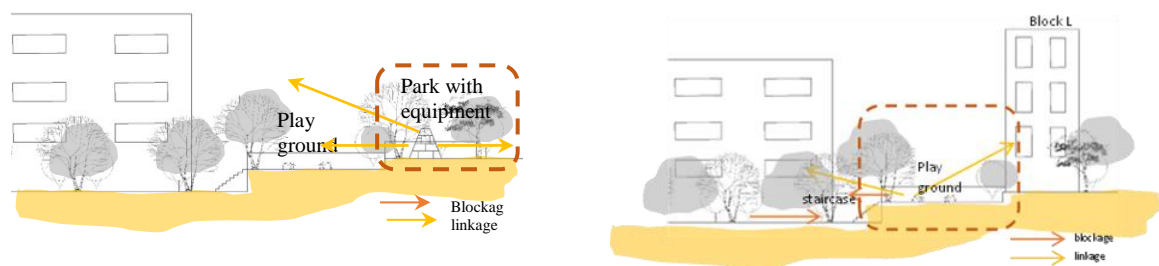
Linkage and blockage through long section of the playground and park with equipment. (According to observations) (Source- Author)
